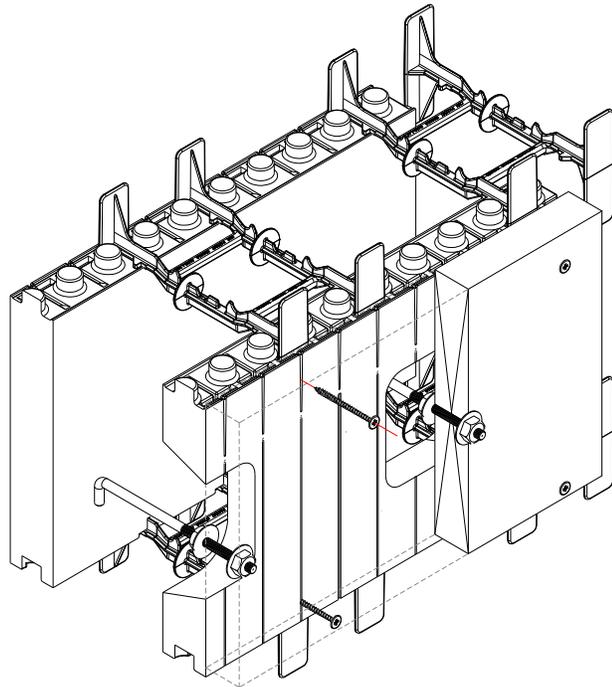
Typical Ledger Board Connection w/ Anchor Bolts
